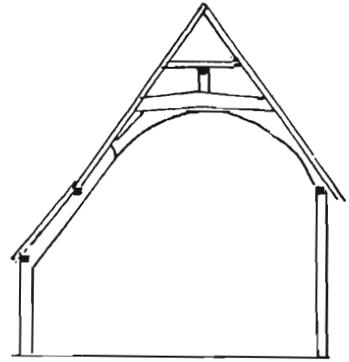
Base cruck truss Dunsters Mill House, Ticehurst.
